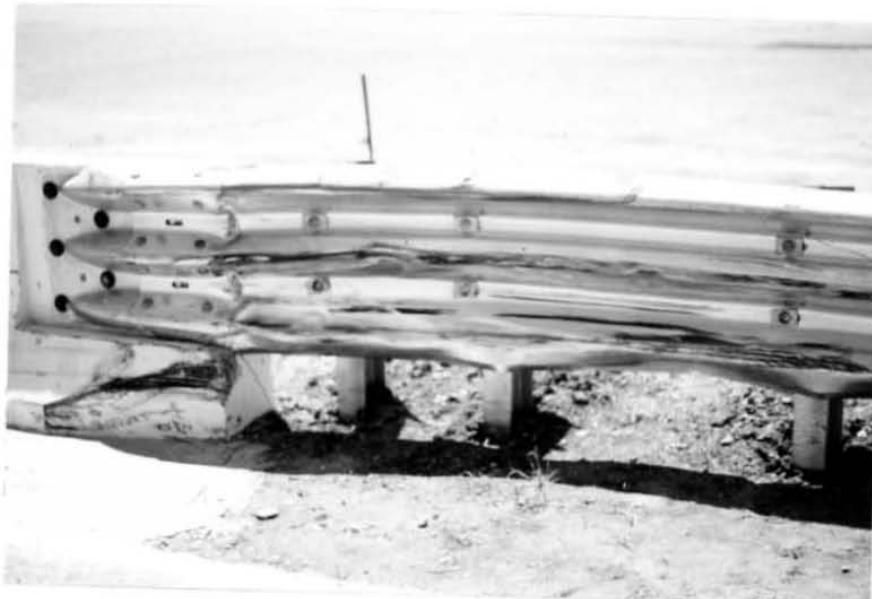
Bridge Anchor Section Damage, Test MBAS-1
